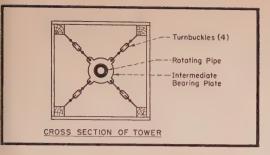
Here is a suggested structure for the intermediate support bearing. The turnbuckles permit the rotating pipe to be centered in the tower.
